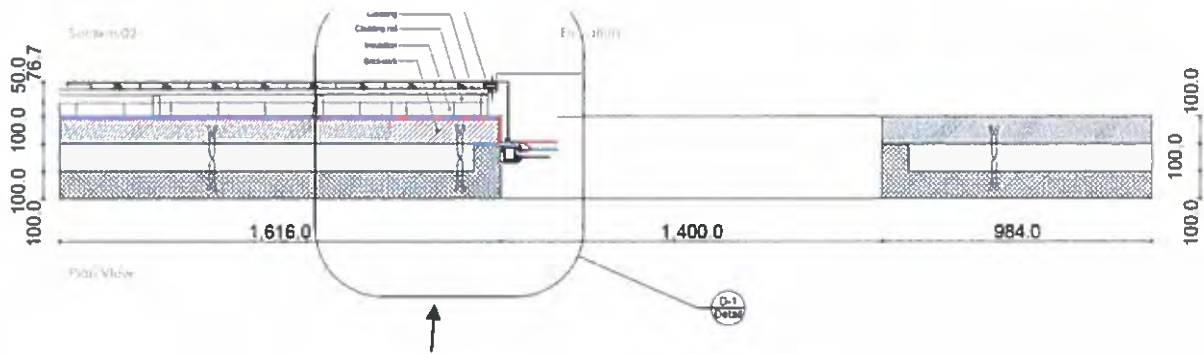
Detail No 5 from vertical cross section, lower edge of cladding system.
